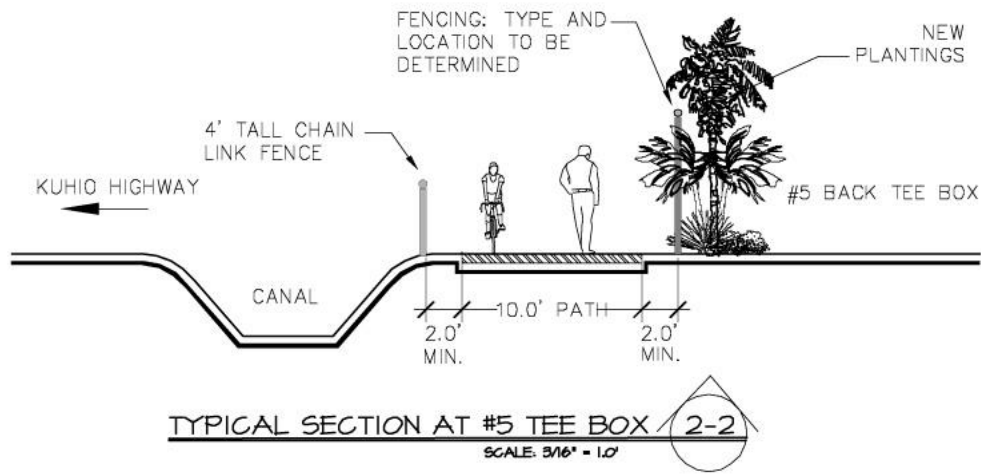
Typical section along the drainage canal at the #5 back tee box
